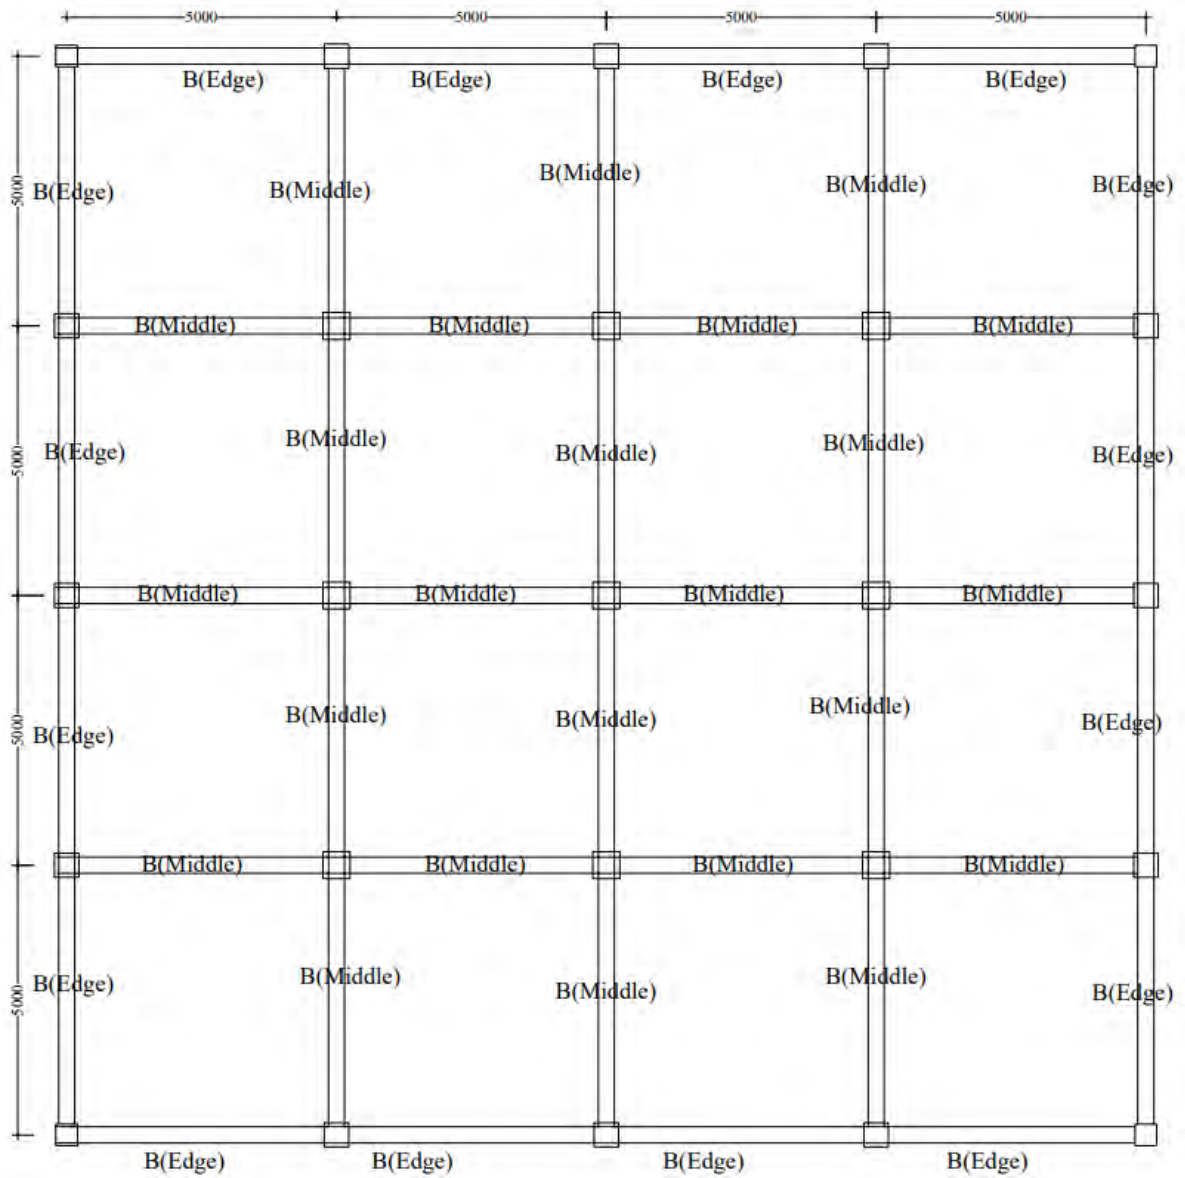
Typical beam layout for 6,10,15-storied RC buildings
